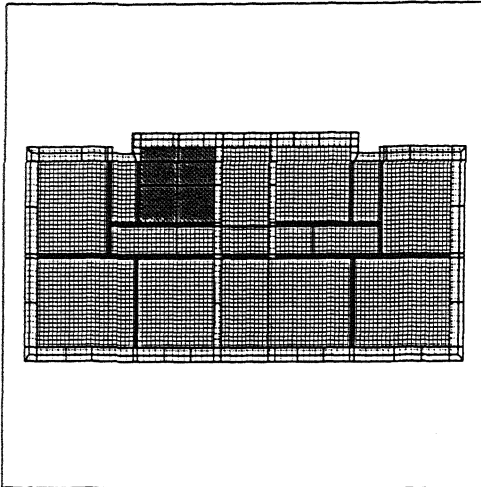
view of the upper-story plan of the building with the reinforced concrete slab constructed in order of substaining the vibrodine (numerical model)
